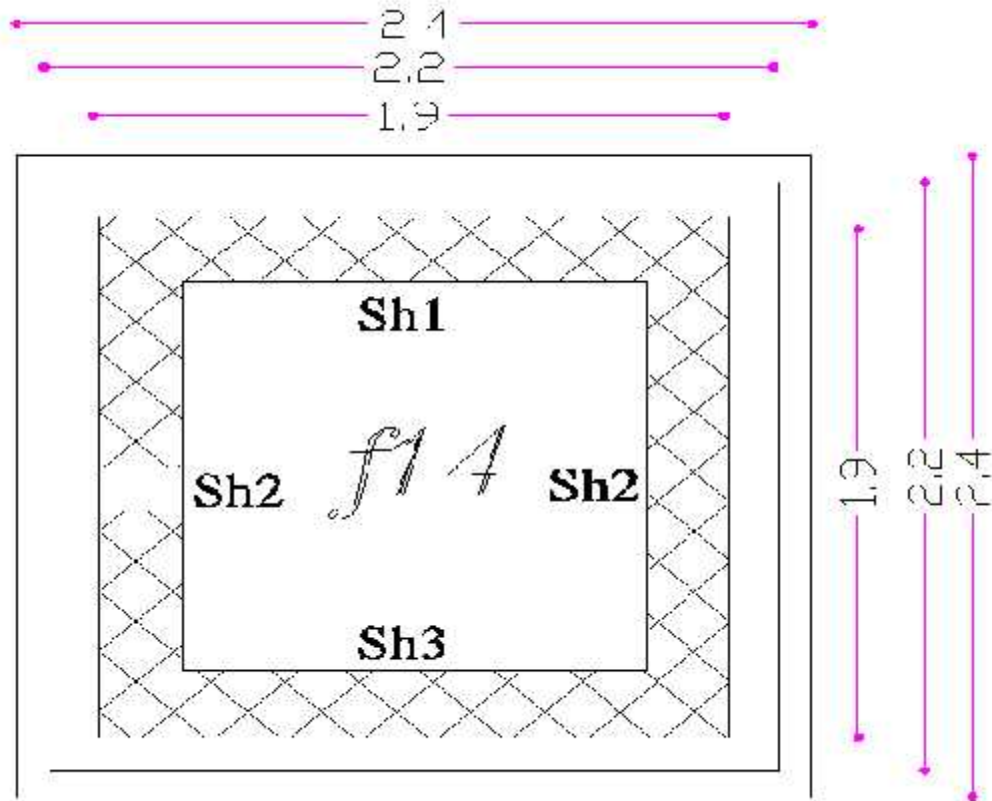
Top view of Mat Foundation(Under Elevator)
